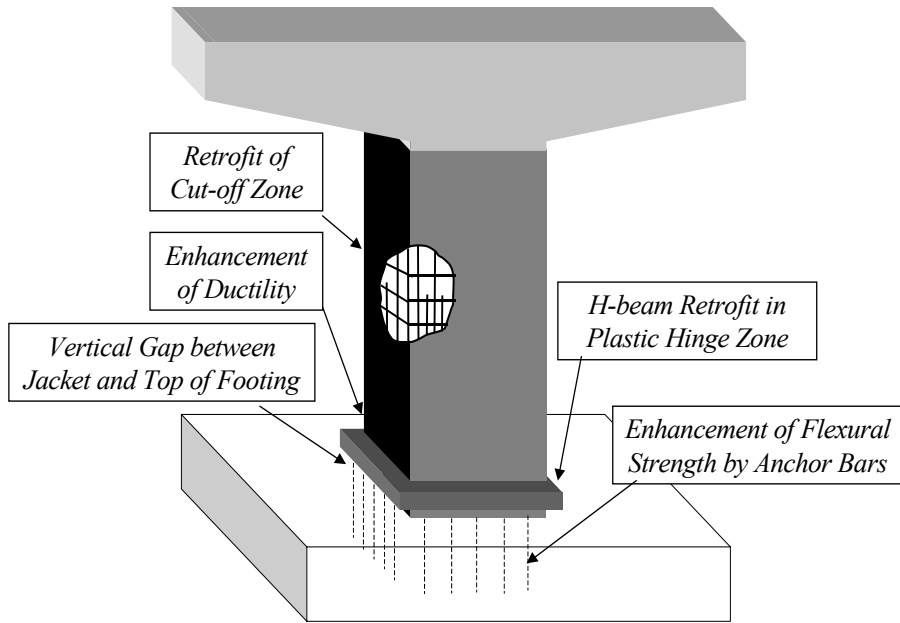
Seismic retrofit of reinforced concrete piers by steel jacket with controlled increase of flexural strength method
